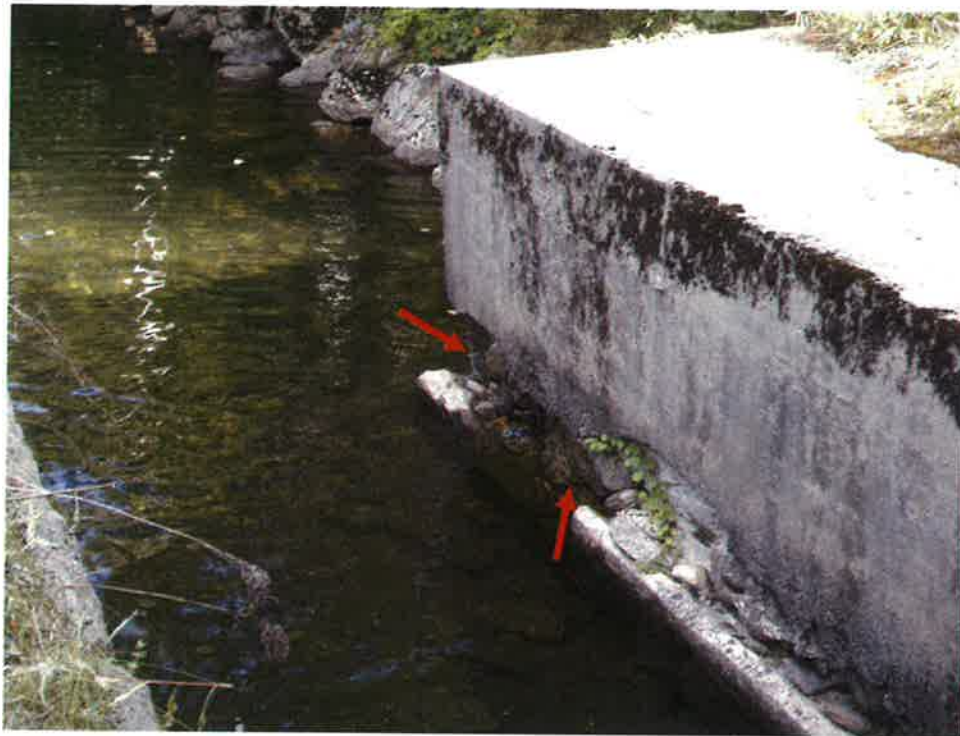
A view of the retaining wall downstream of the powerhouse tailrace. The arrow points to severe undercutting of the wall at foundation level.
